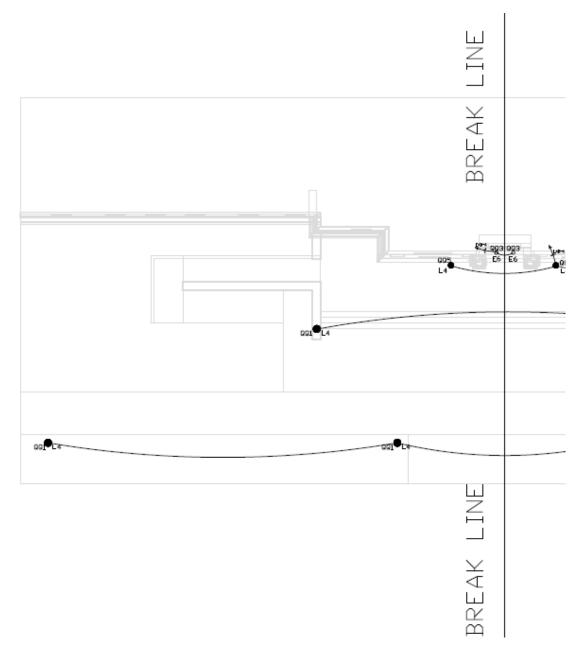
First Floor Circuiting Plan for East Entry and Façade – South Of Entrance
